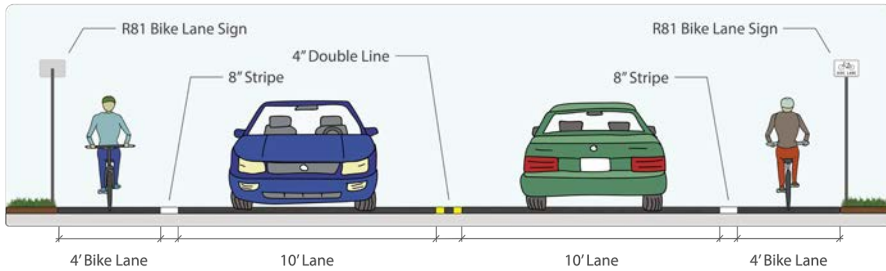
Class II - Buffered Bike Lane Without Curb and Gutter or Parking
